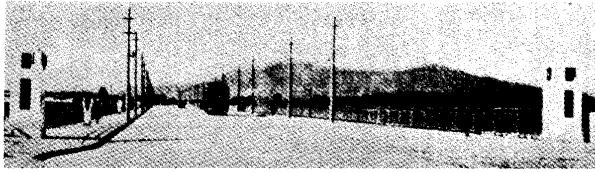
Bridge over Han-gang at Kyongsong. Steel deck truss bridge. View shows walks, traffic lanes and double-track tram line. 1929.
